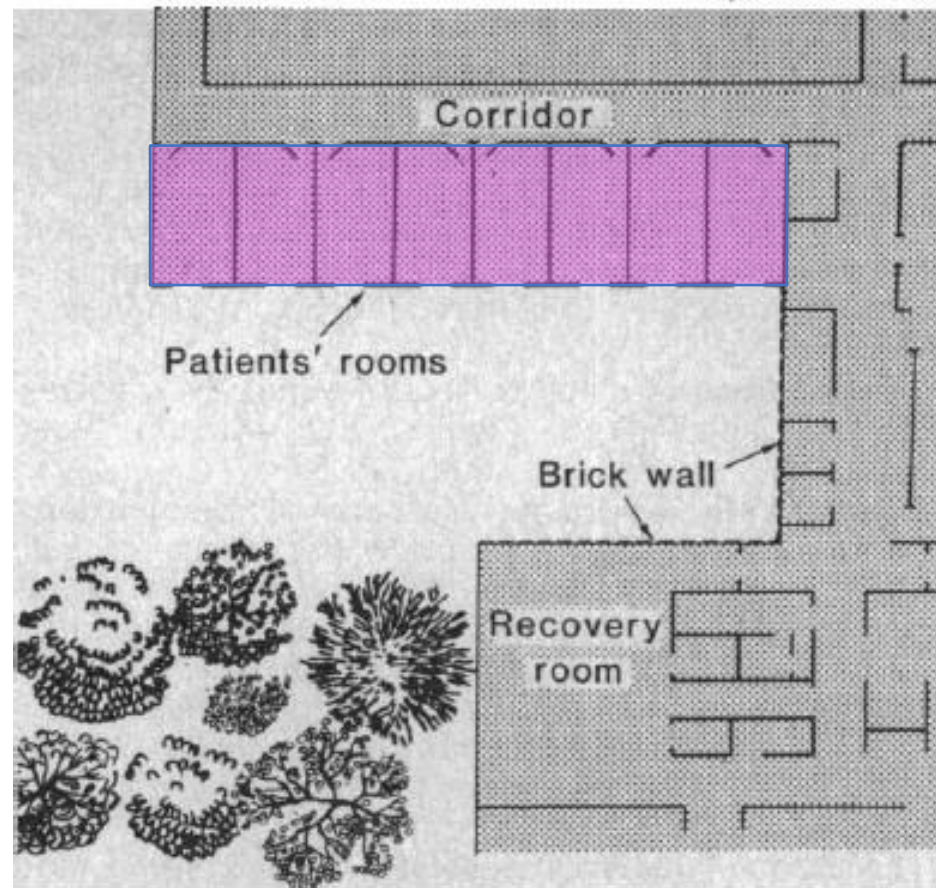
Plan of the second floor of the study hospital showing the trees versus wall window views of patients. Data were also collected for patients assigned to third-floor rooms. One room on each floor was excluded because portions of both the trees and wall were visible from the windows. Architectural dimensions are not precisely to scale.
